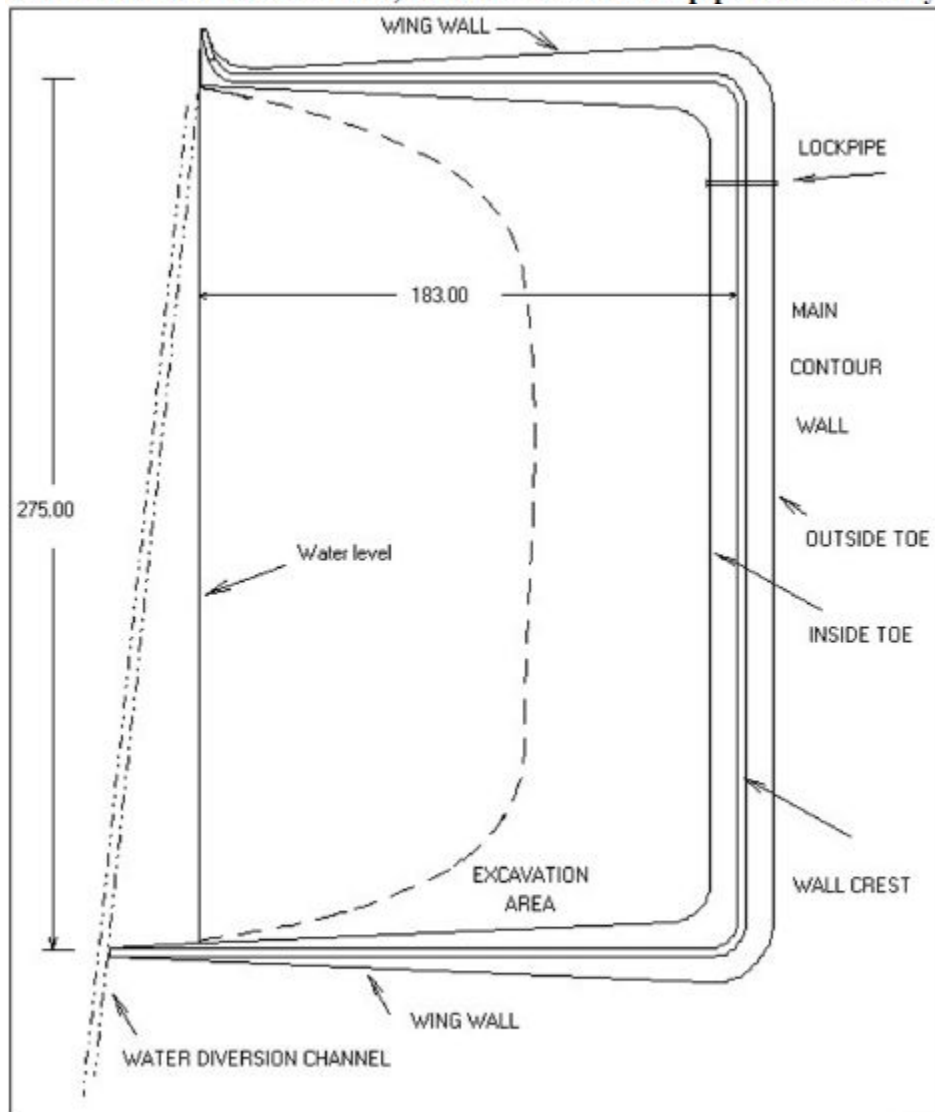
Plan of contour dam showing wall, water diversion channel excavation area and wing wall.
